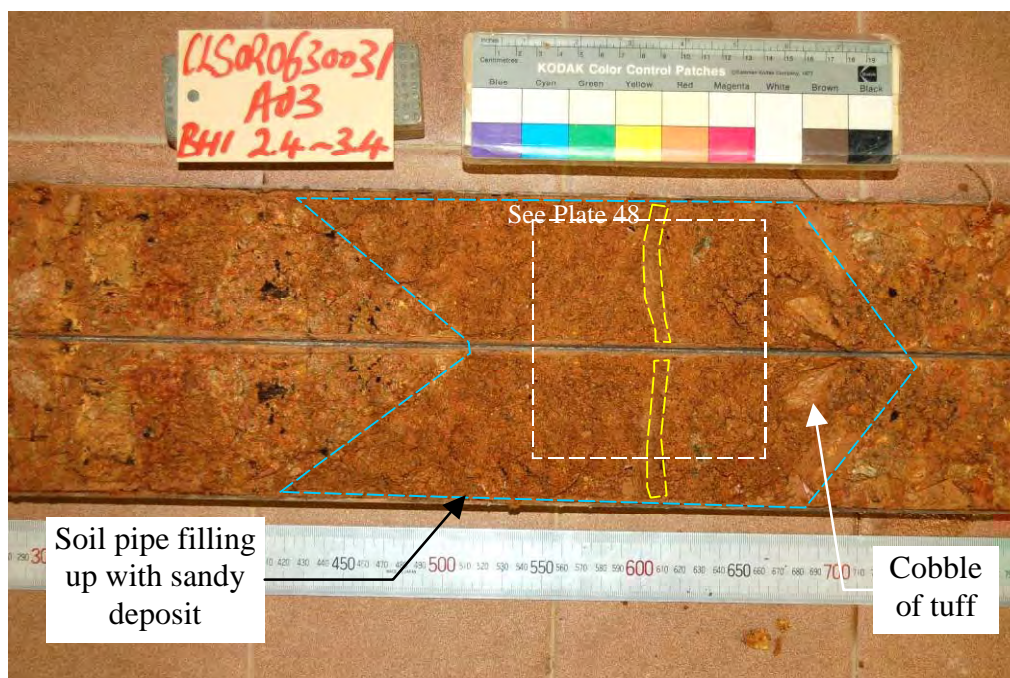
Sandy Soil Pipe Deposit with Horizontal Clay Layer at 3 m Depth in Drillhole No. BH1
